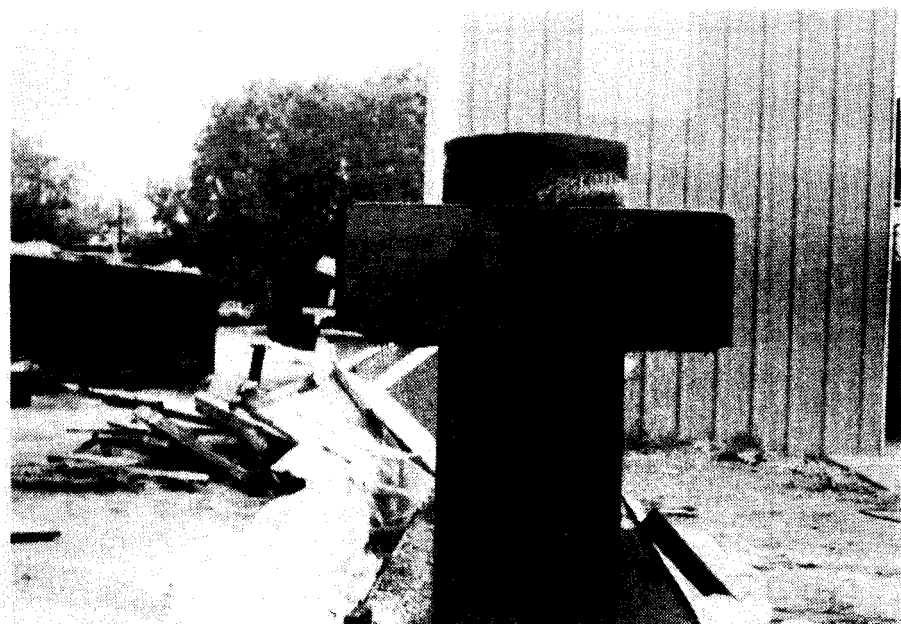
Isolated Pipe in Quarter Scale at Disassembly.
